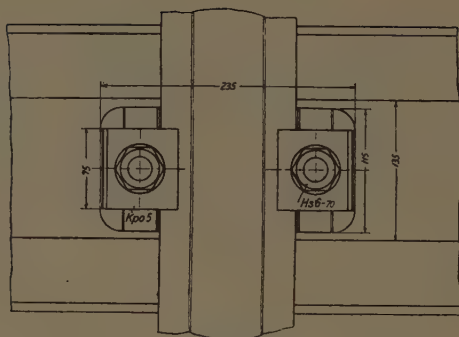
g*. — Plan of rail on intermediate sleeper (steel).
